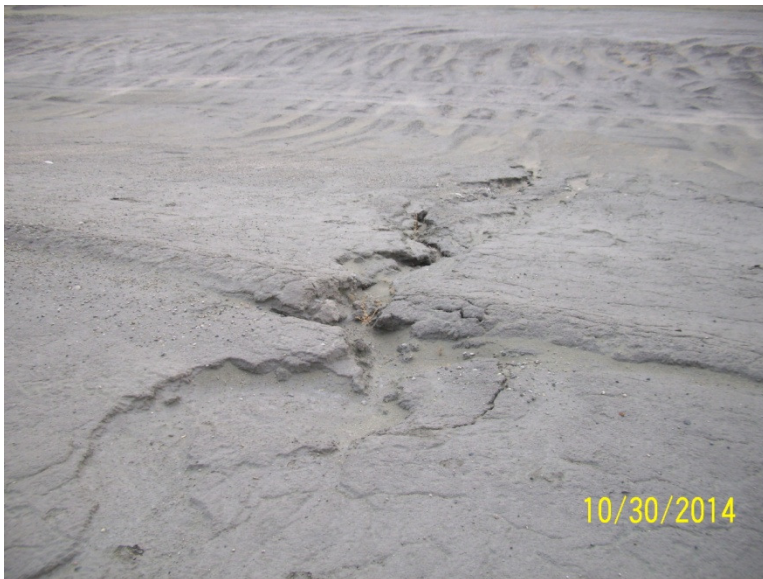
Huldra Tailings Facility (Gulley in downstream slope)
